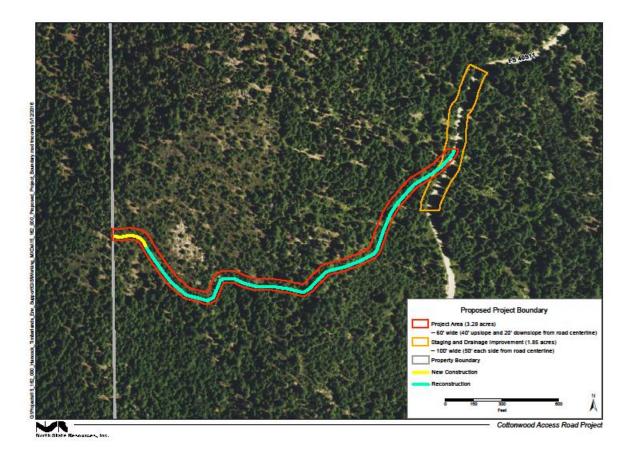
The proposed action would approve access that requires reconstruction and use of 0.44 miles of existing ridgetop road and construction and use of 0.05 miles of new road from the terminus of the existing road to the Hancock property boundary.
